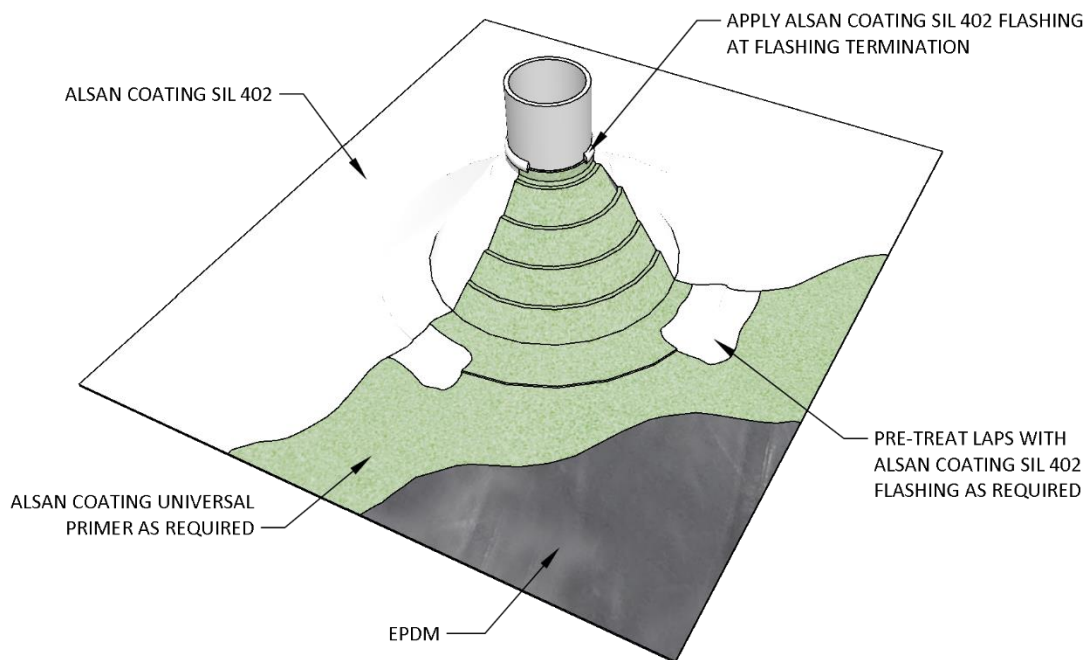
Silicone Roof Coating Over EPDM, Penetration
